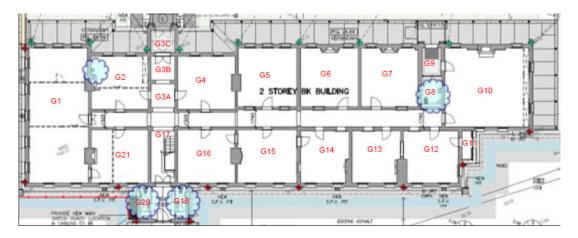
Ground floor existing services identified & clouded in Blue - Room G2, G18&G20 (outside) and G8 to the east.
